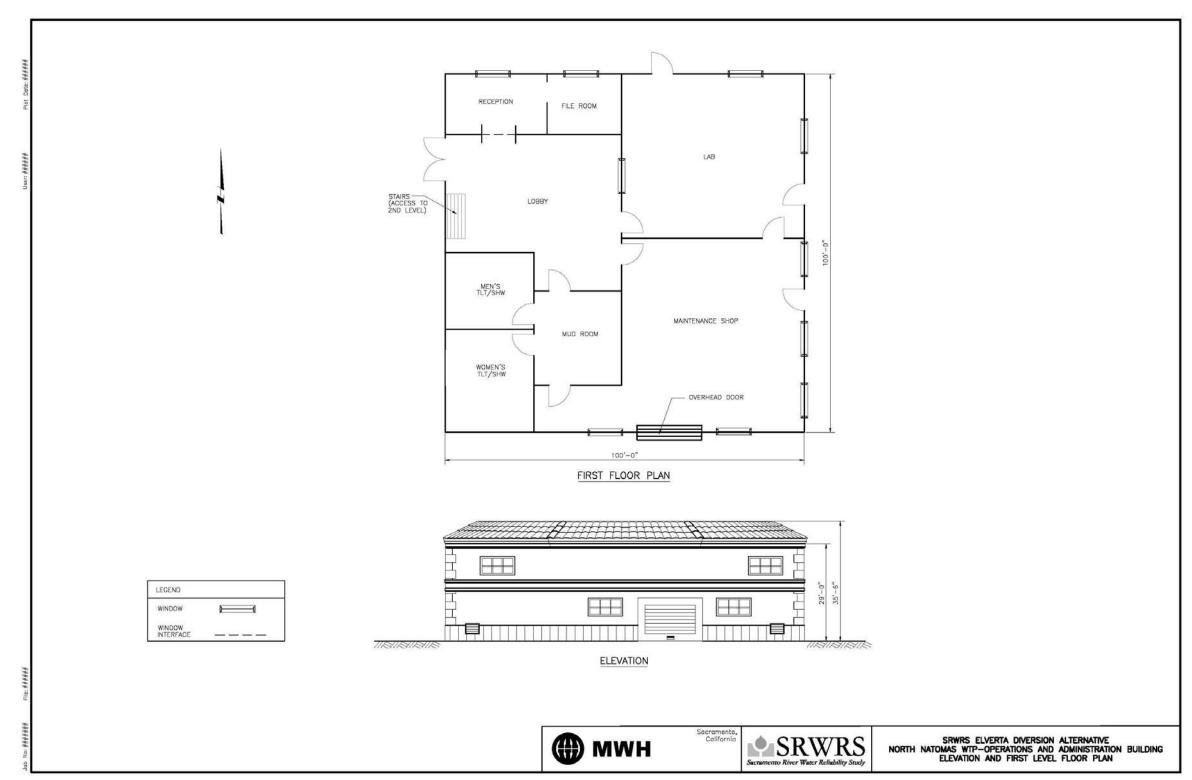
North Natomas WTP – Operations and Administration Building Elevation and First Level Floor Plan
